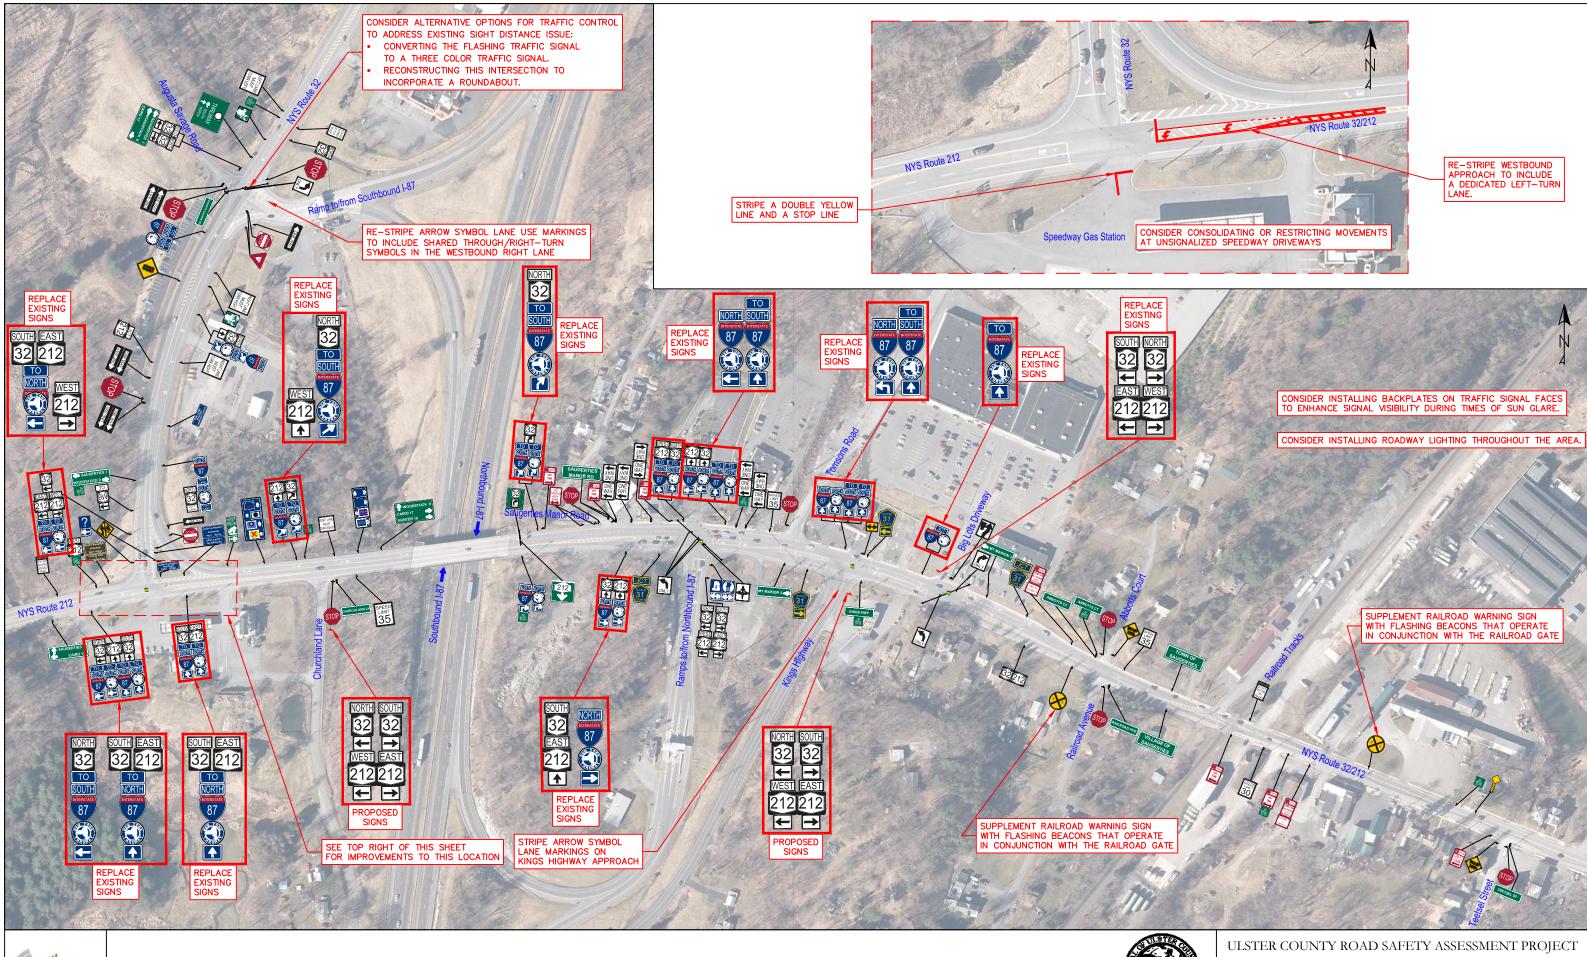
WOODSTOCK CONCEPTUAL IMPROVEMENT PLAN
